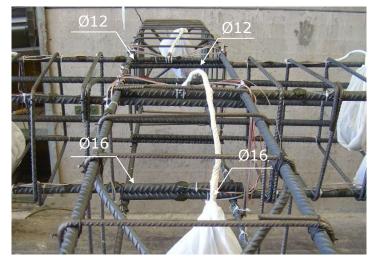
Arrangement of the overlapping reinforcements inside the joint.
